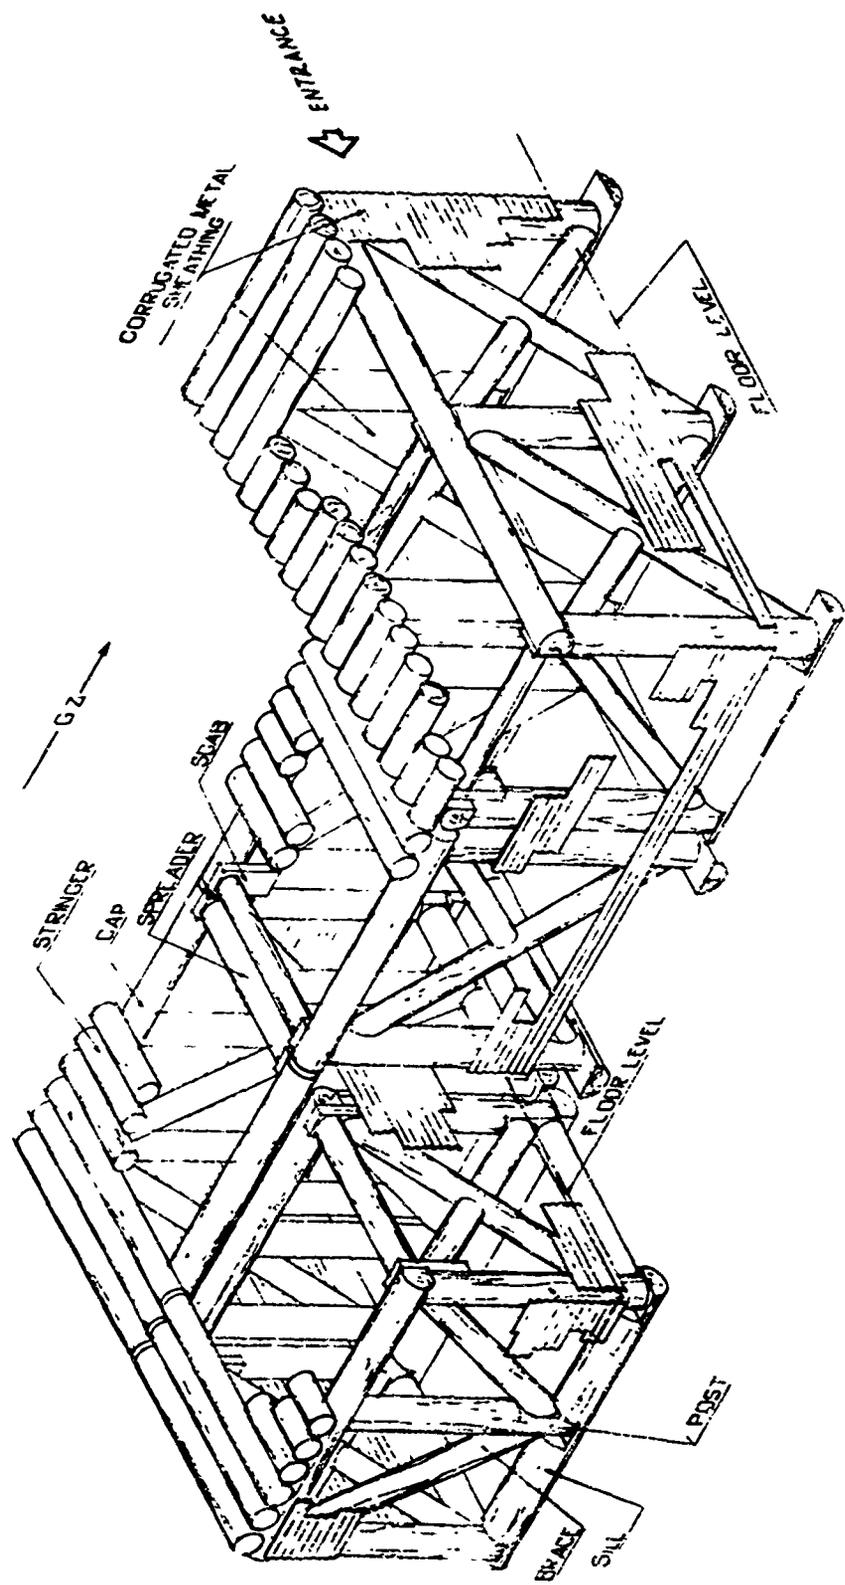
8' x 12' modular shelter, round timber (two 0' x 6' sections).
